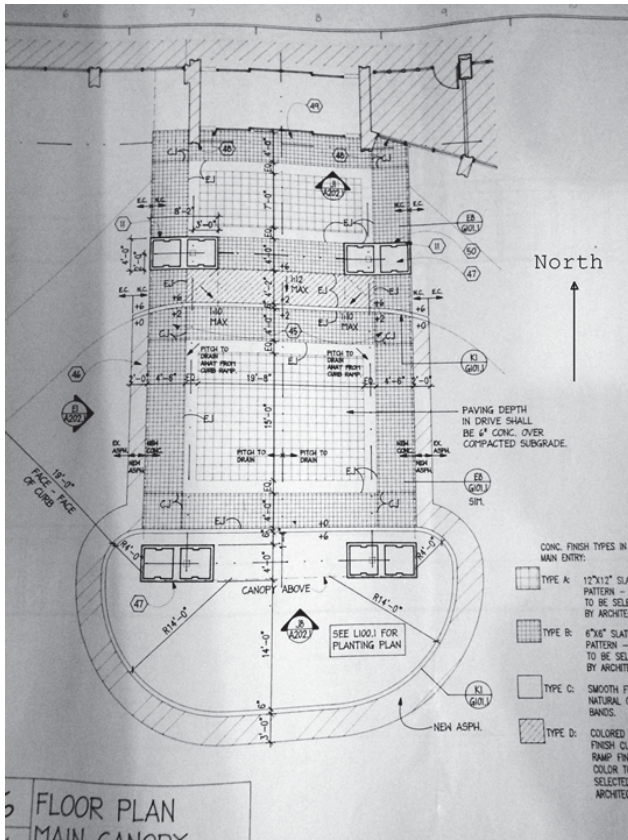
Radisson remodeling plans, 1997 (Building plans)
